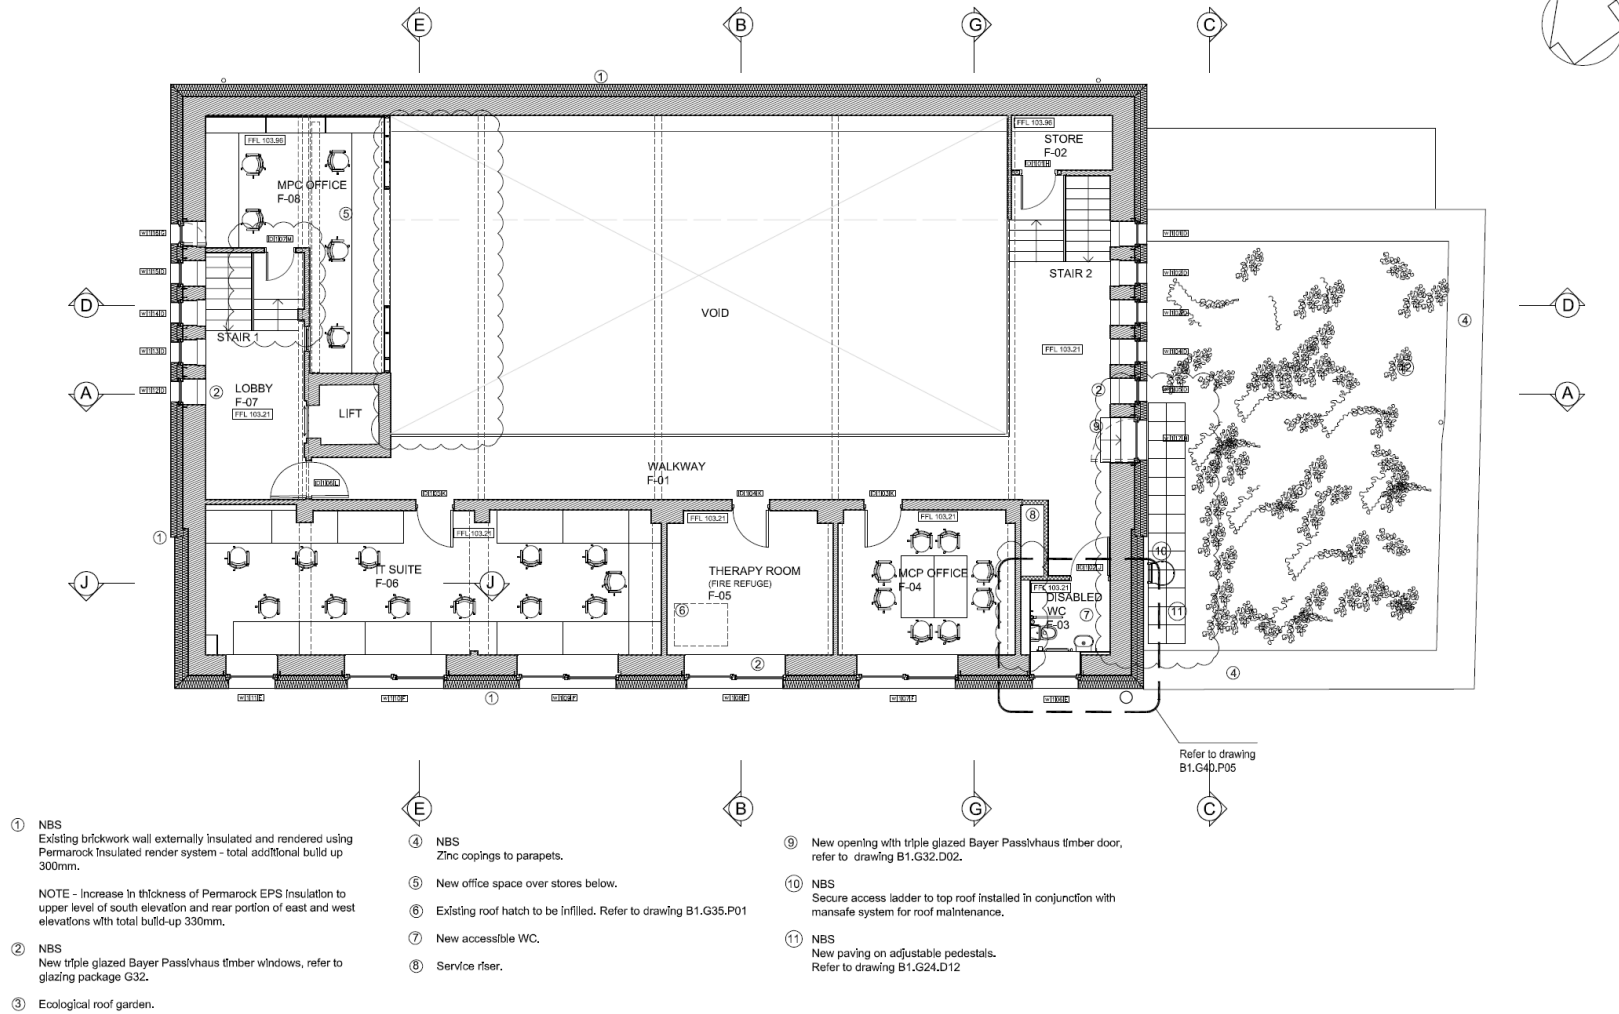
Architectural Plan Post-retrofit Mayville Community Centre First Floor
